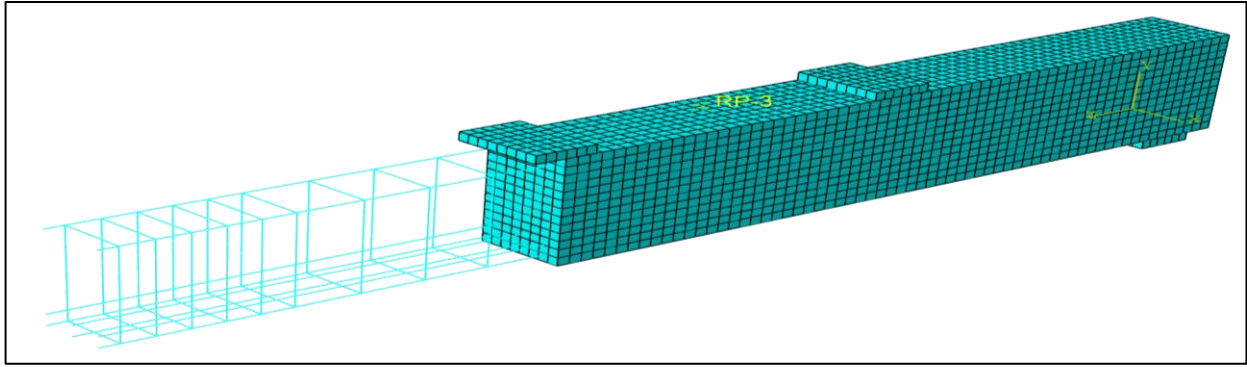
Finite element mesh of the hybrid reinforced concrete beam showing 20 mm element size for all parts element
